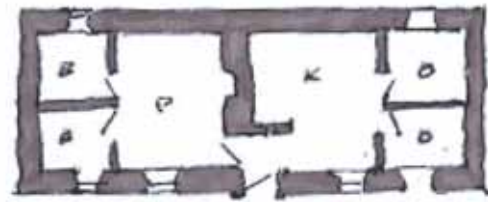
Sketch of traditional cottage – narrow floor plan
